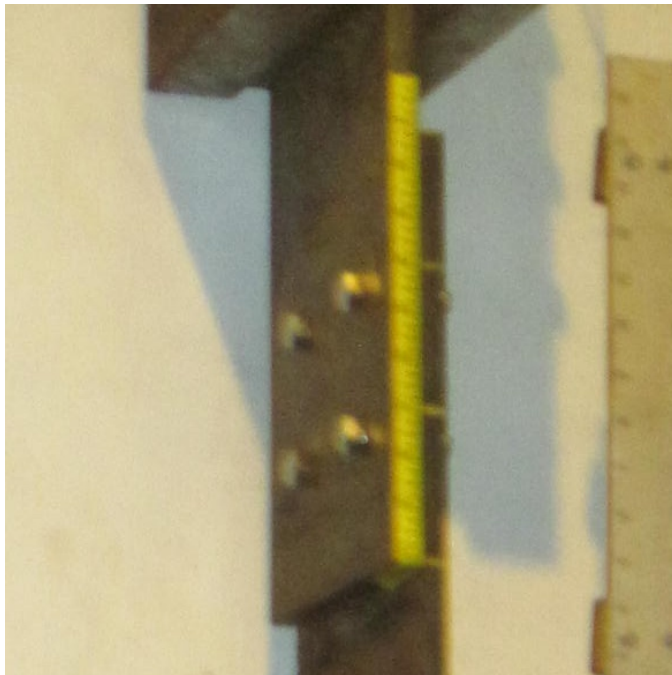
Typical Joint Configuration 4, Bolted, Single Shear Specimen.
